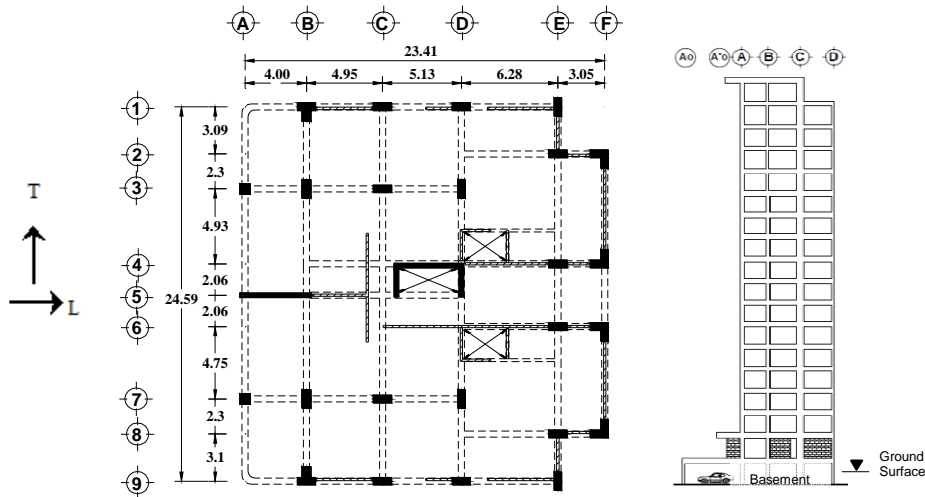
Typical structural floor plan and frame through axis 3 and 7 in L component (dimensions in m)
